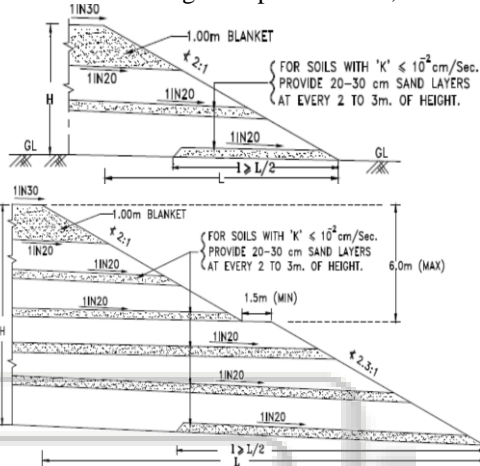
Typical Embankment profile for sandwich construction with cohesive soil for height up to 6m and 6 to 12m
